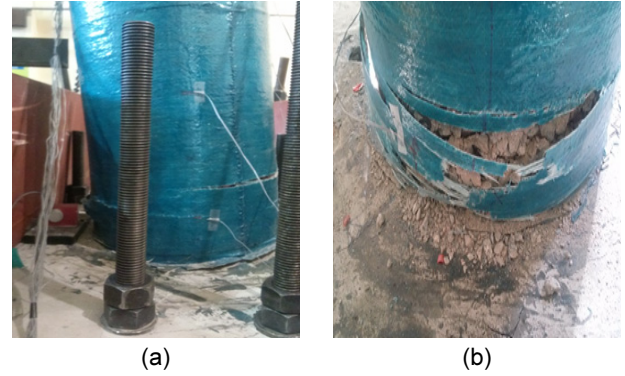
C-GF: (a) Concrete crack visible through GF sheet, $6\Delta_y$ (b) GF rupture, monotonic loading
